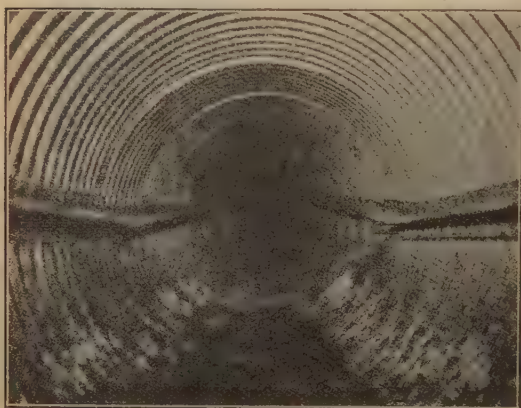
View inside of nestable 36-inch pipe assembled in a tunnel 60 feet below and directly under the track.
